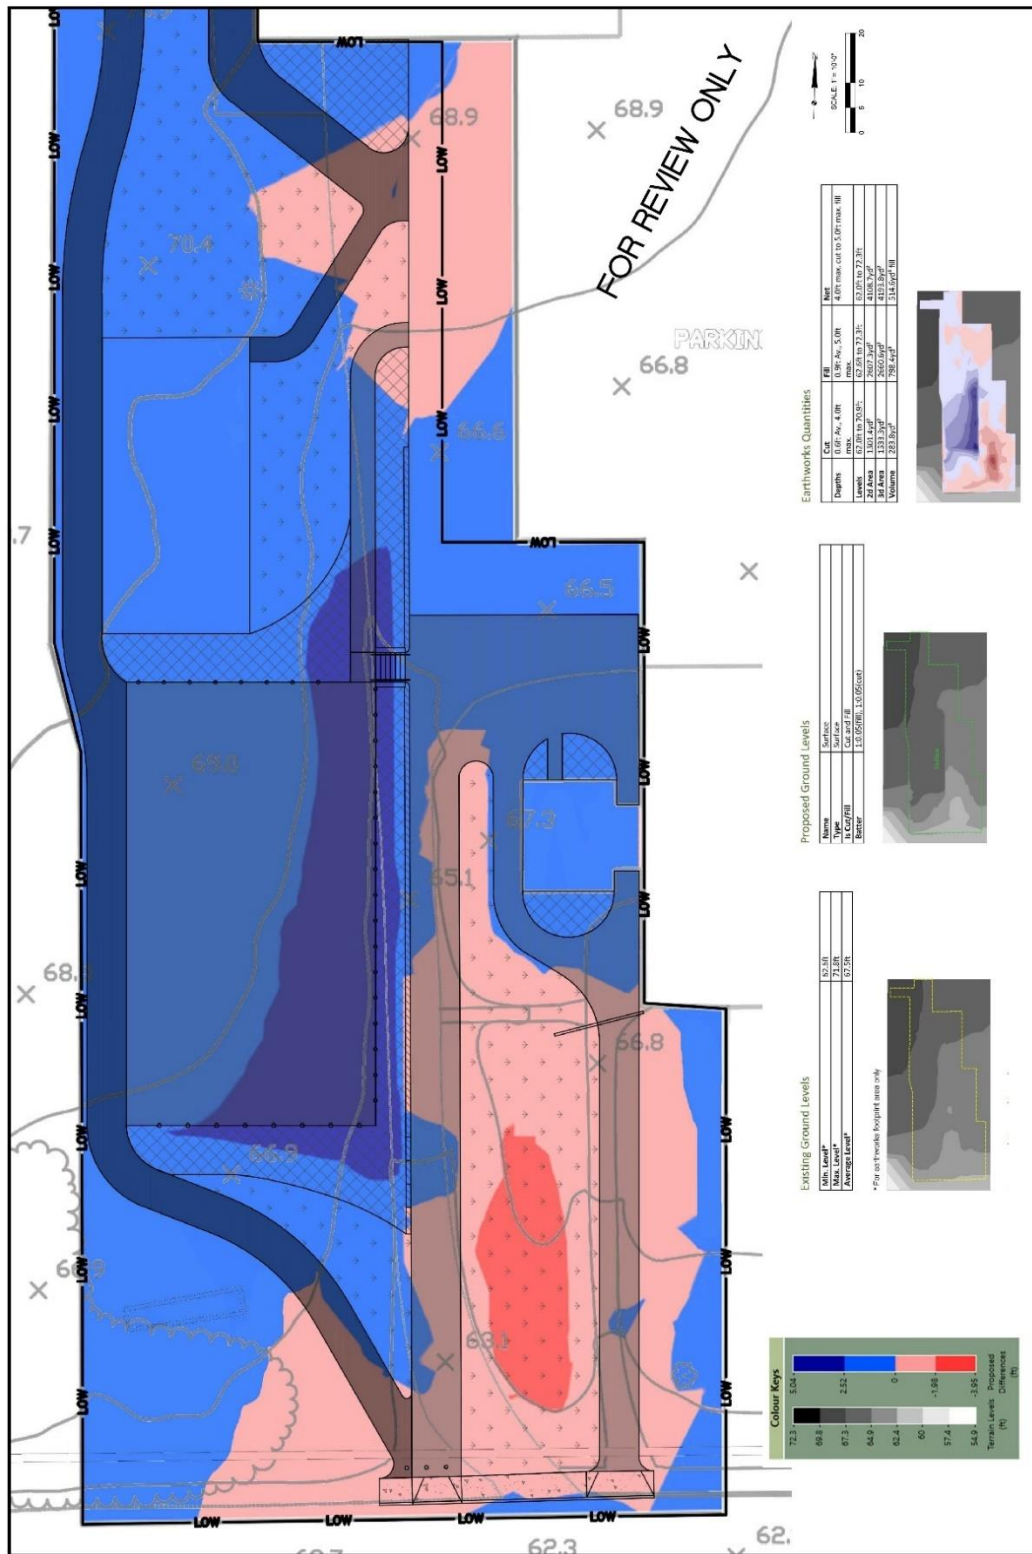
Jamestown Lawn Avenue Recreation Complex Drainage Improvement Detail.
